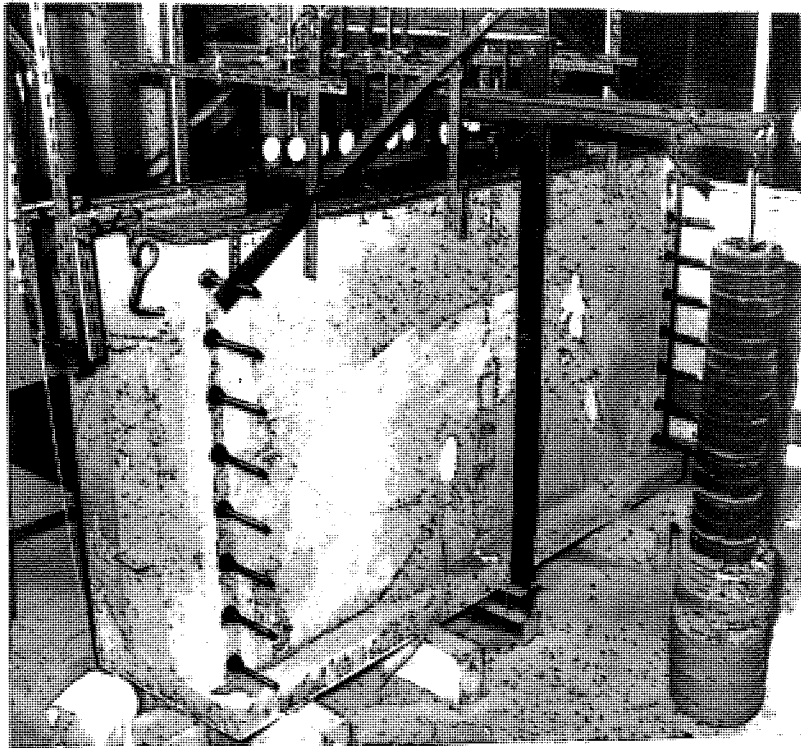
THE BOX SECTION BEAM UNDER CONCENTRATED LOAD (TWO DIMENSIONAL TEST)
